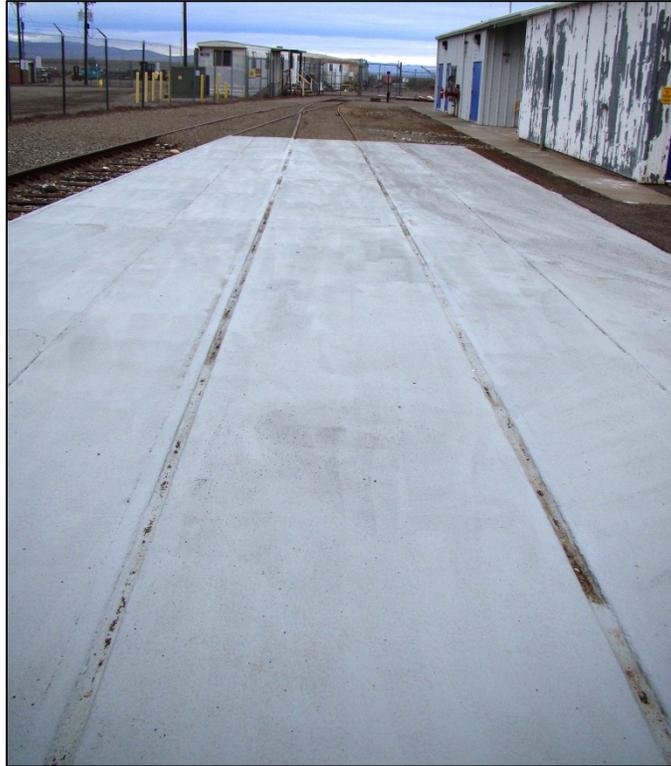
2706-T Outdoor Storage Area (March 2013)
